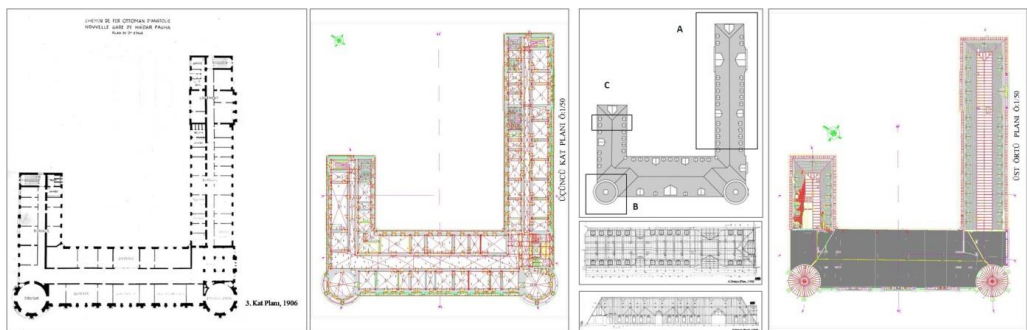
Building surveying plan dated 2014 and prepared by Ritter and Cuno (Left) 2nd Floor (+14.75), 3rd Floor (+14.55)
